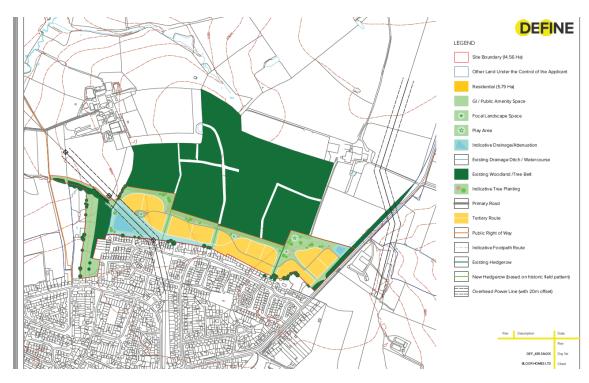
Indicative Masterplan for c.200 dwellings on land North of Spondon.
